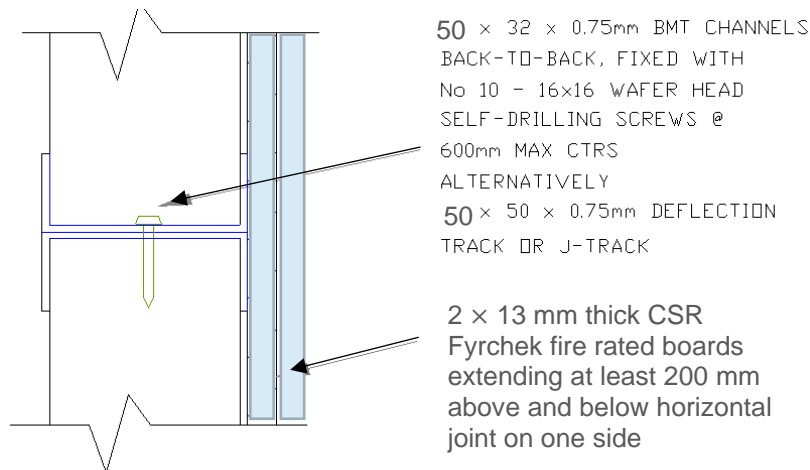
Horizontal joint Type 8 – 50 mm Hebel AAC panel
